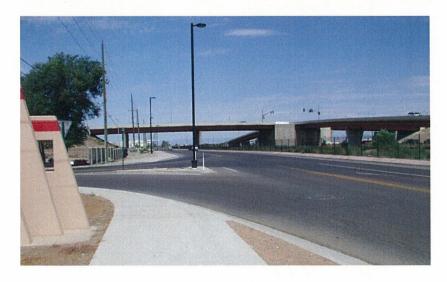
Proposed Design 7<sup>th</sup> Street and Grand Avenue
